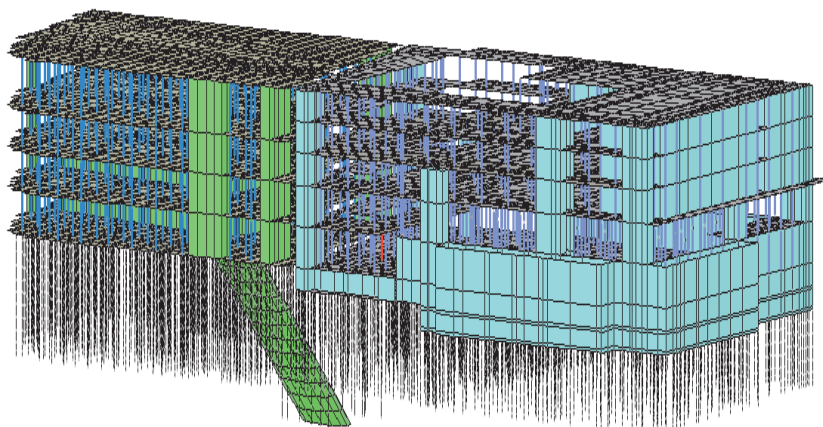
Location of the designed building above the previously constructed inclined subway tunnel (design detail)
